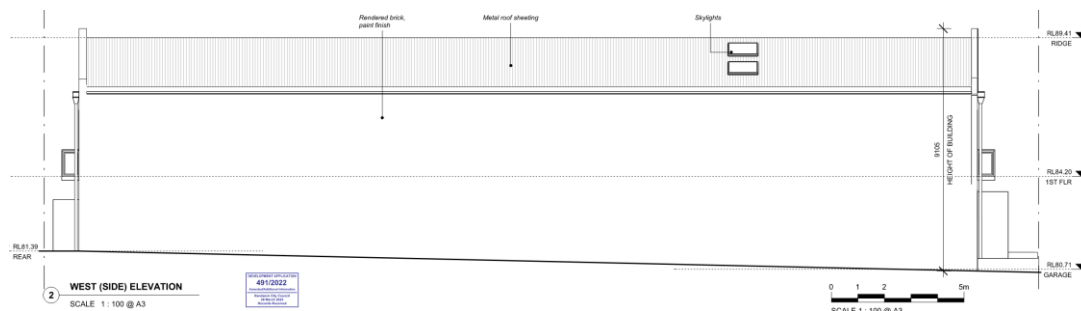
Proposed West (Side) Elevation (Source: HallGroup & Co)
